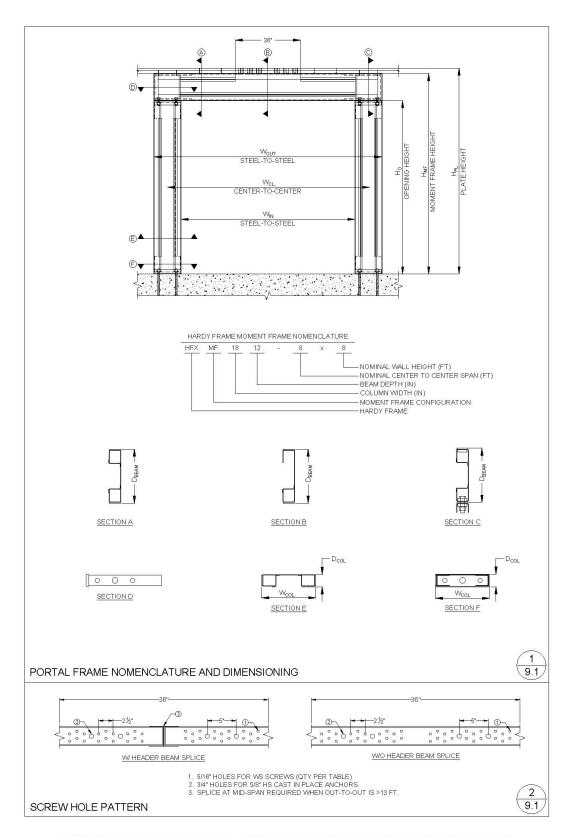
PORTAL FRAME INSTALLATION DETAILS
